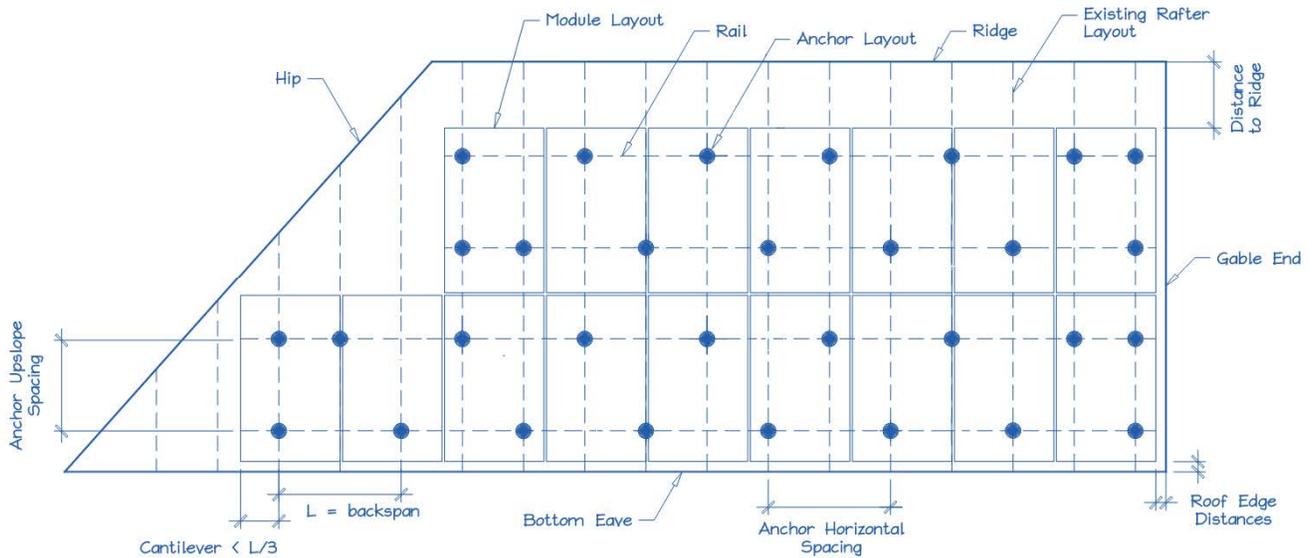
Solar Panel Array and Staggered Anchor Layout Example (Roof Plan)
